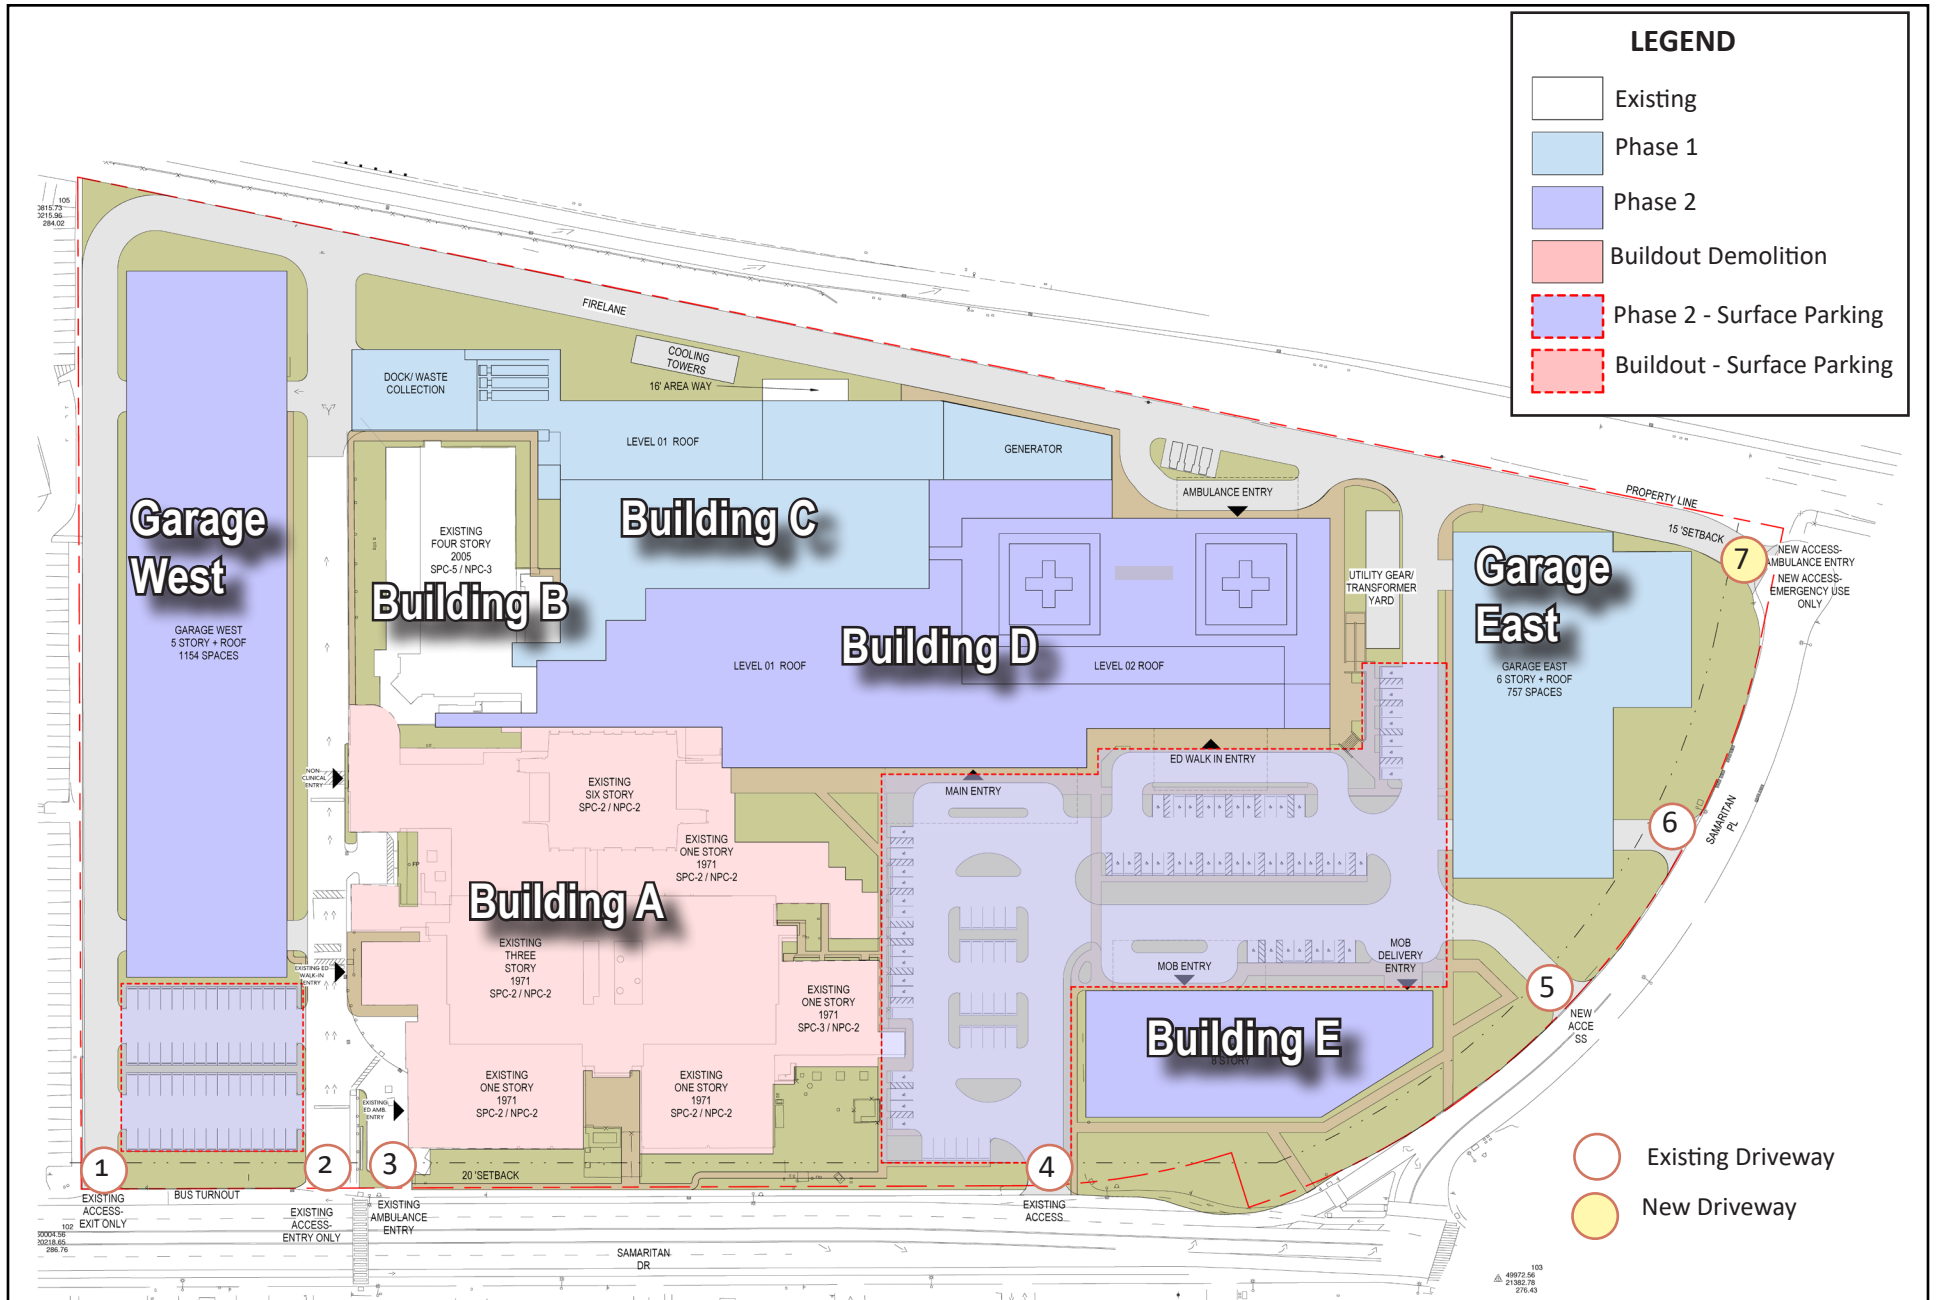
Proposed Project Phase 2 Conceptual Site Plan
